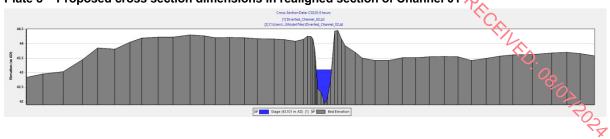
Proposed cross section dimensions in realigned section of Channel 01 /
